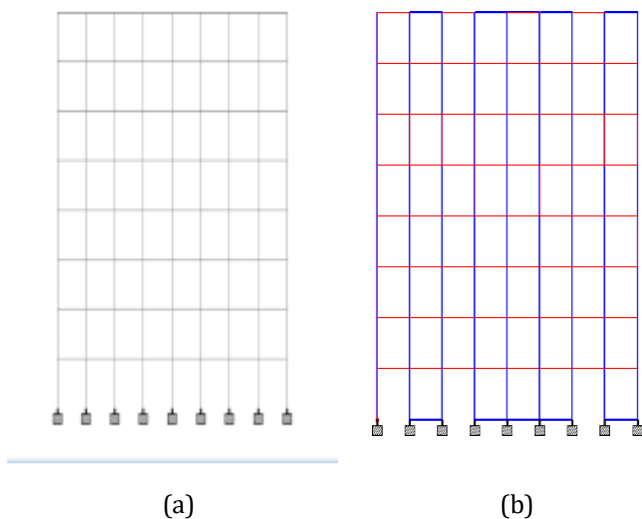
Model(a) without shear wall and Model (b) with shear wall
